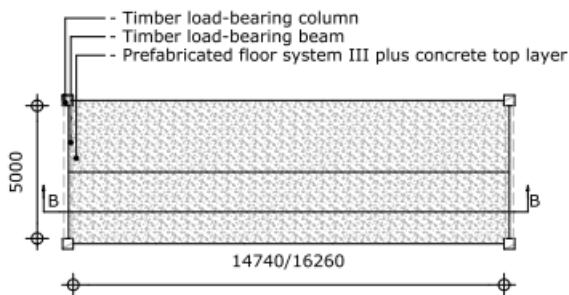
Global layout prefab timber floor system III plus a concrete top layer in mm
